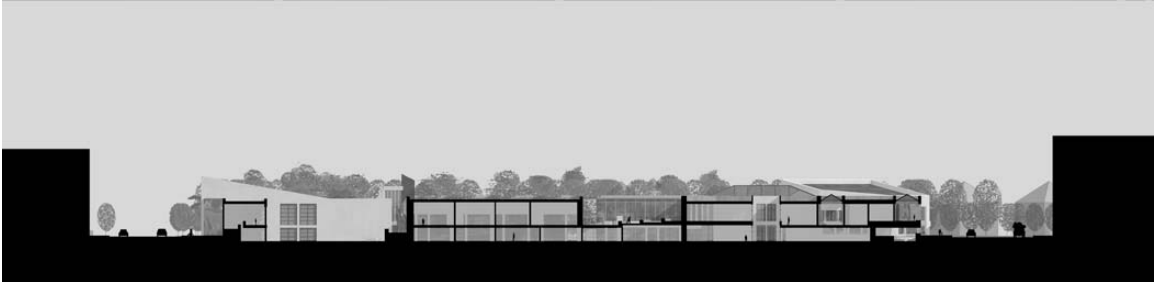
Site Section Facing East in Proposed New School of Orlando Campus
